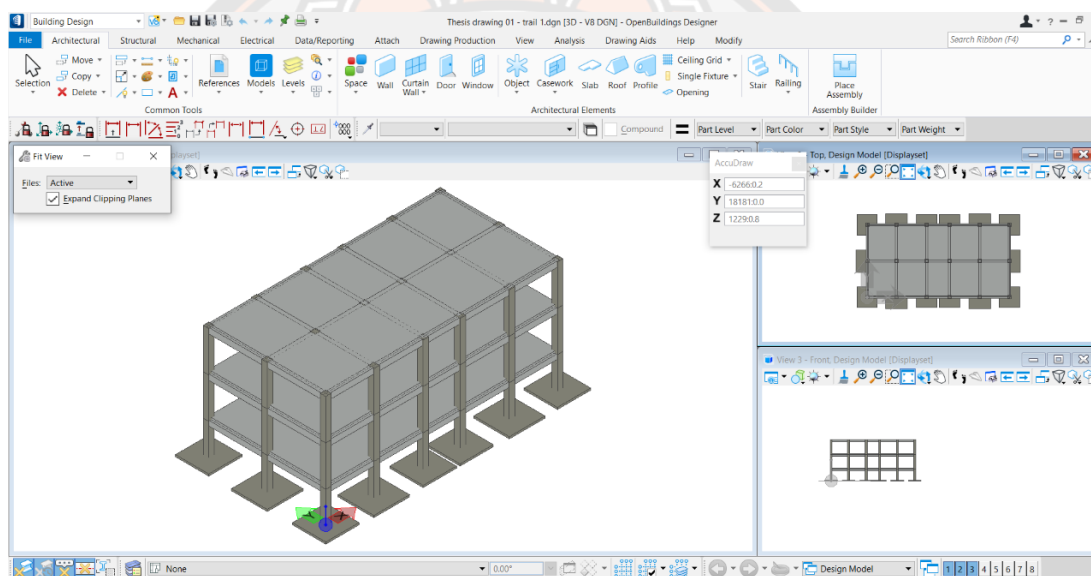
Beam, Column, Footing, and Slabs Created in Open Building Designer
